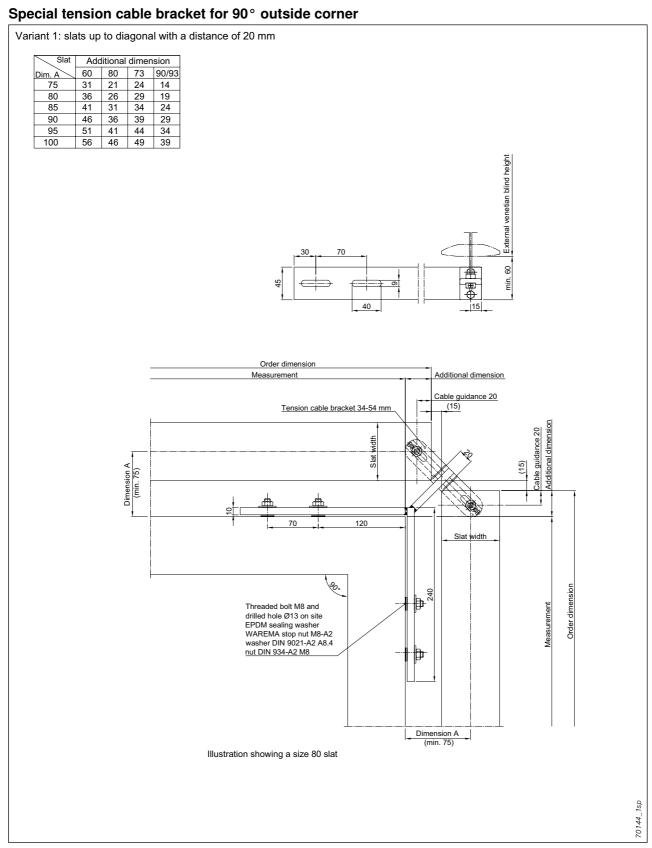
Special tension cable bracket for  $90^{\circ}$  outside corner
